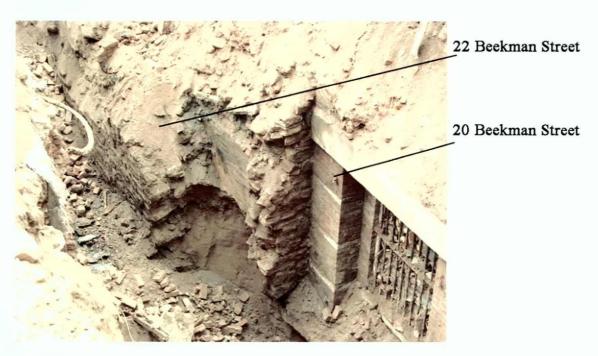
View of the back walls of 20 and 22 Beekman Street, looking southwest.
